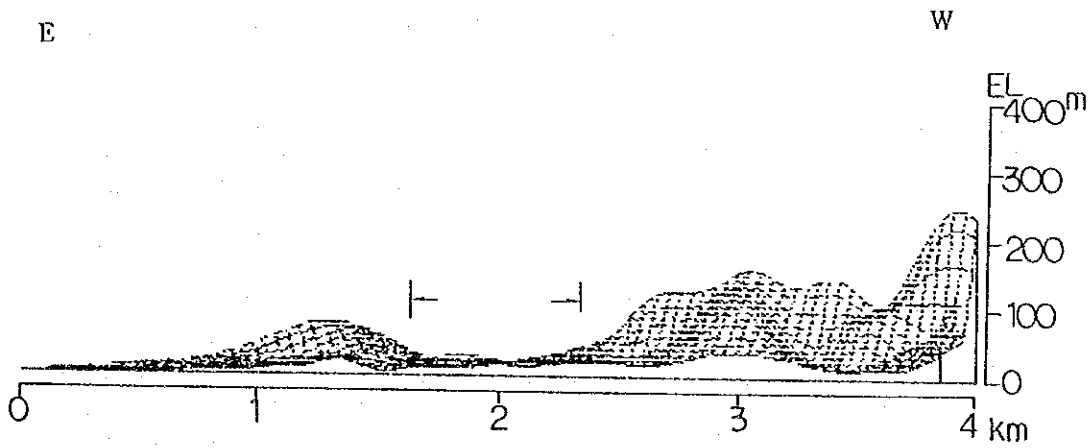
Cross Section along Dam Axis of Khao Che Tra Dam Site
